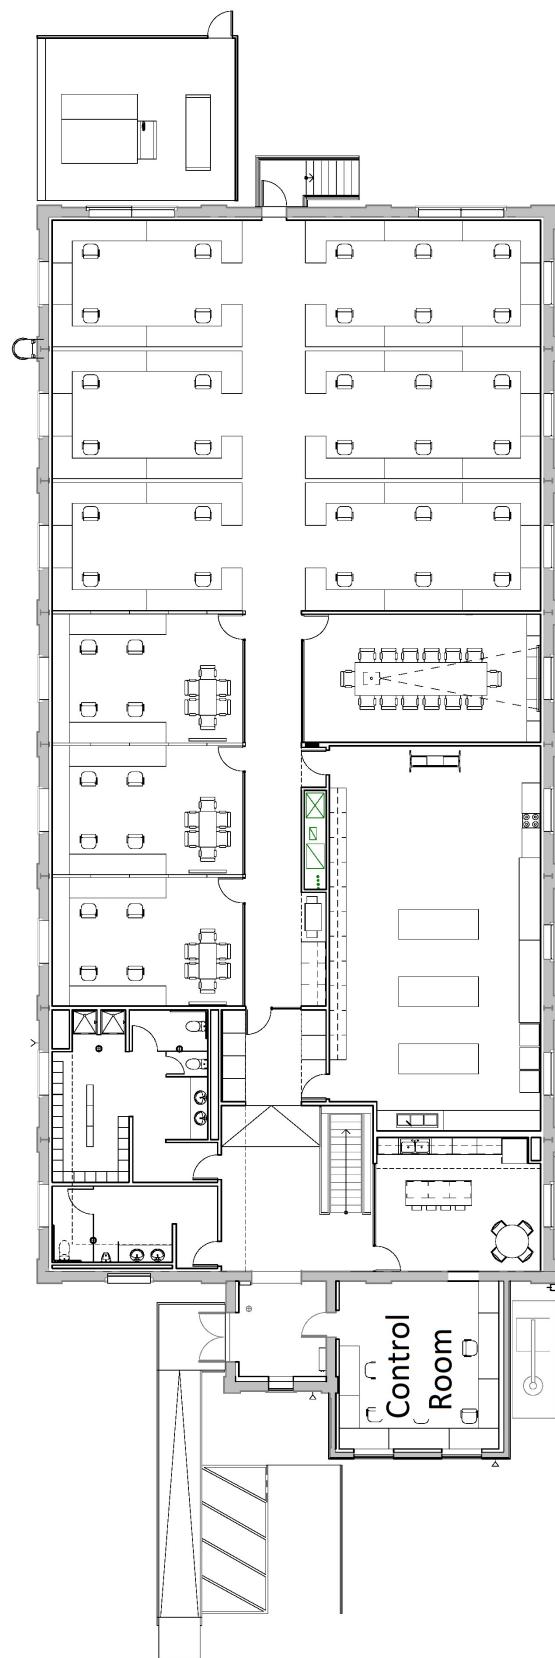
Ross Dry Building renovation, main floor, showing the planned location for the control room (Command and Control Center).
